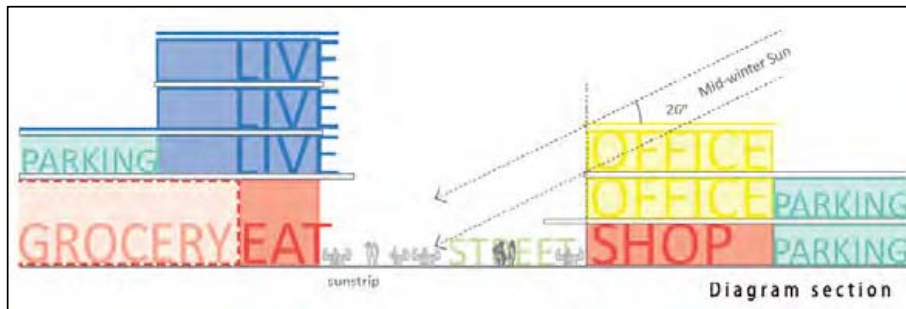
diagram section of Eat Street [mid-block link](#) opportunity (view towards Bay Road)
